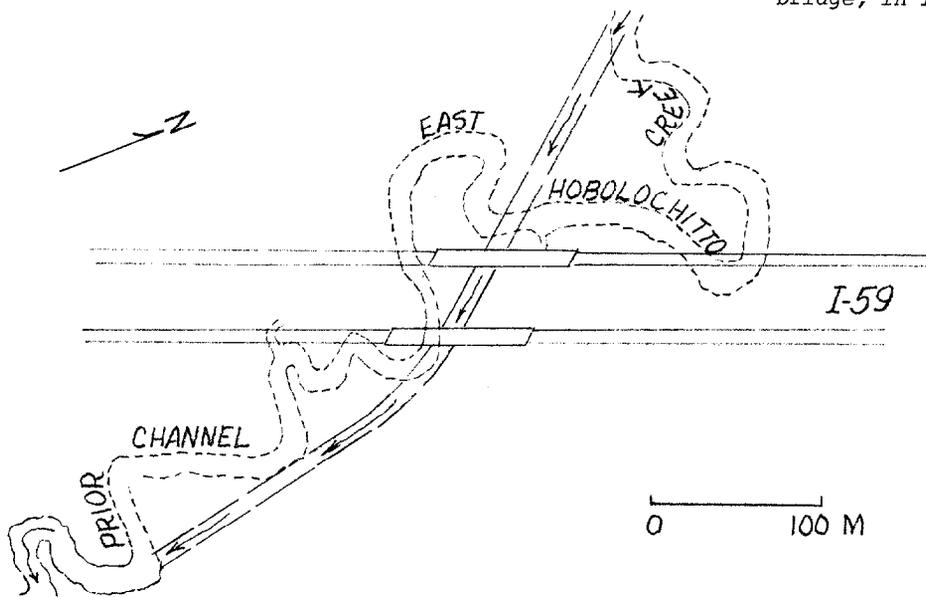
Plan sketch of East Hobolochitto Creek channel relocation.
